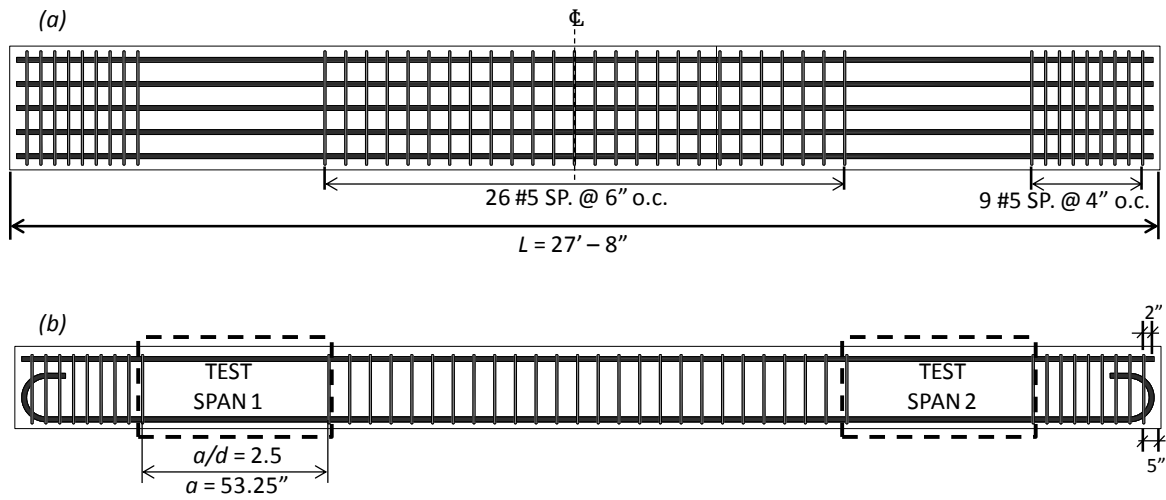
Overall specimen views. (a) Plan view; (b) Elevation view.
